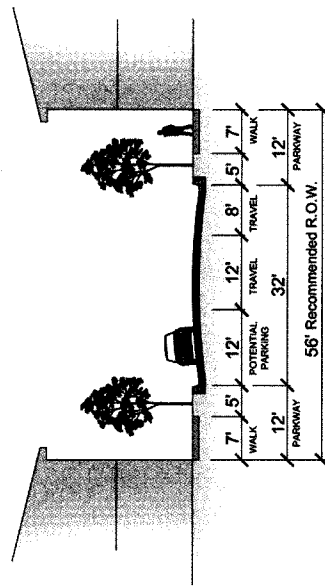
Typical Local Street Conceptual Cross-Section D-D'
